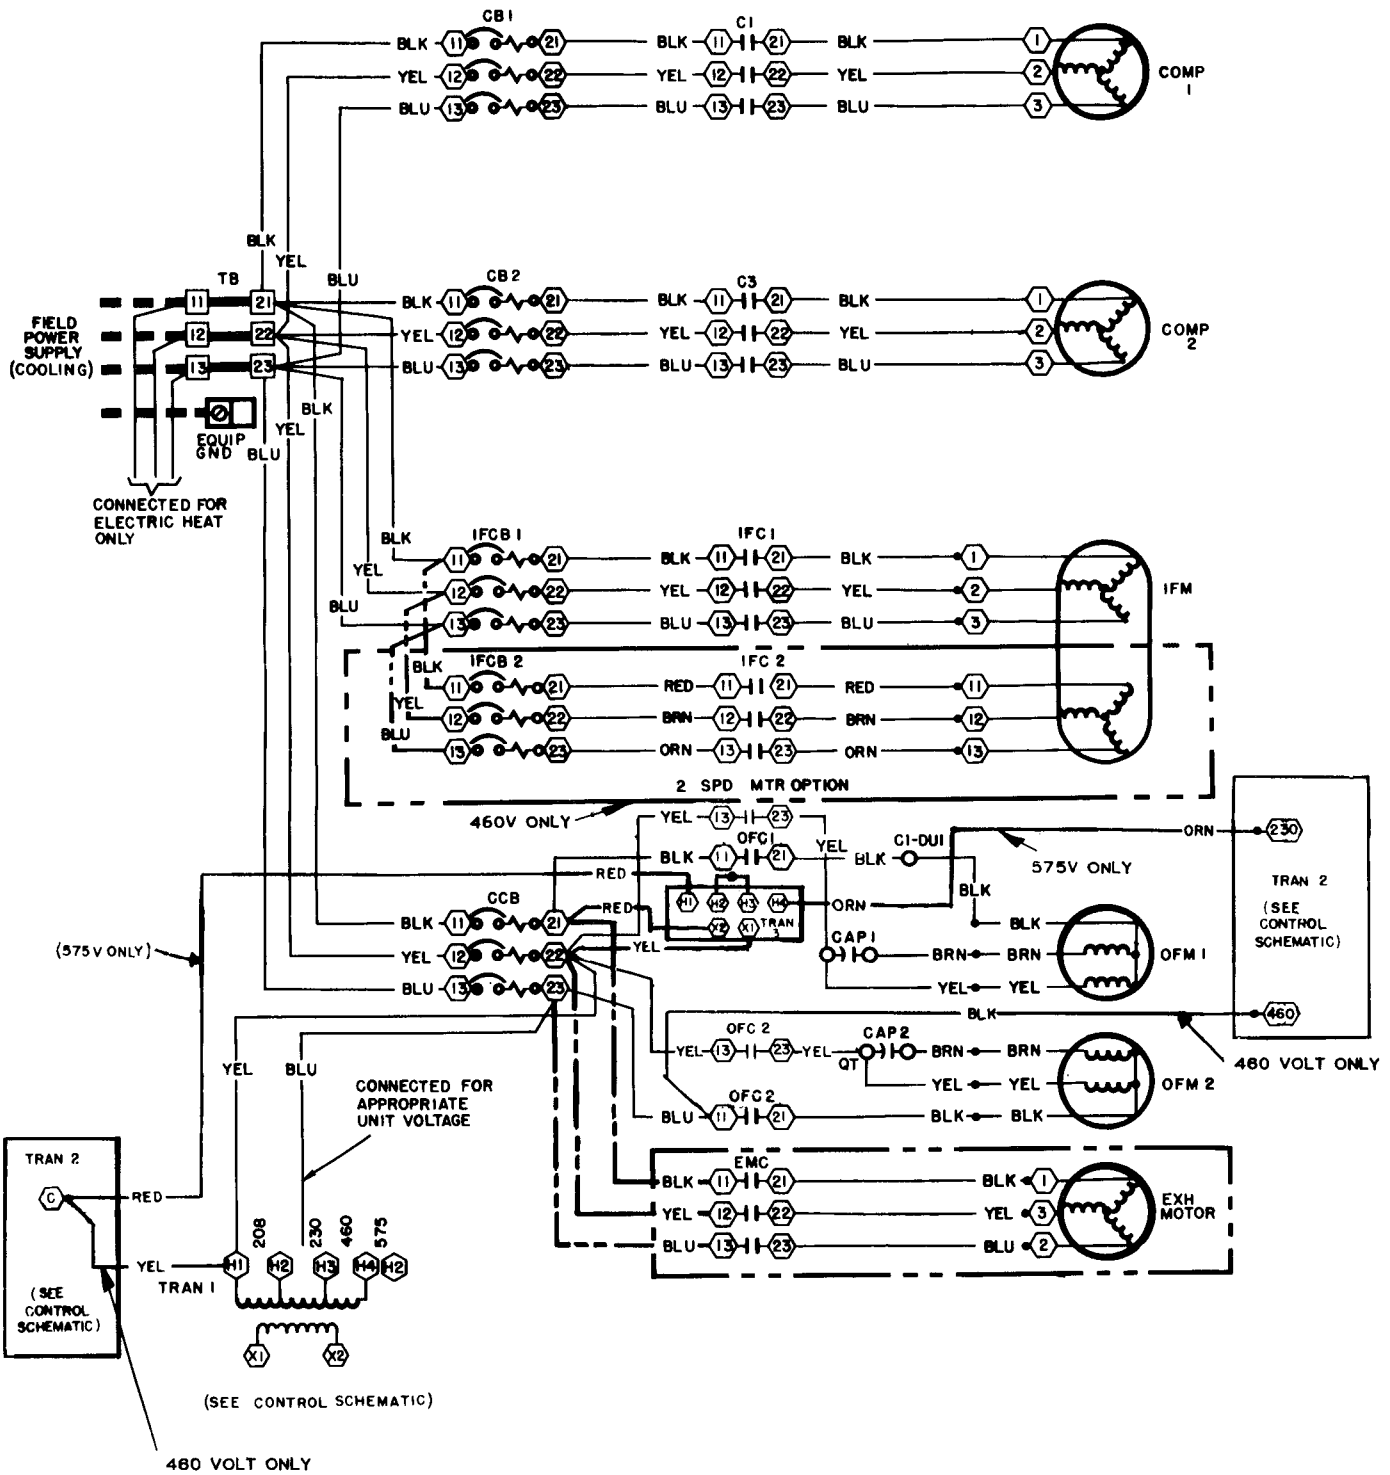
Power Wiring Schematic; 50DF028; 460, 575-3-60
